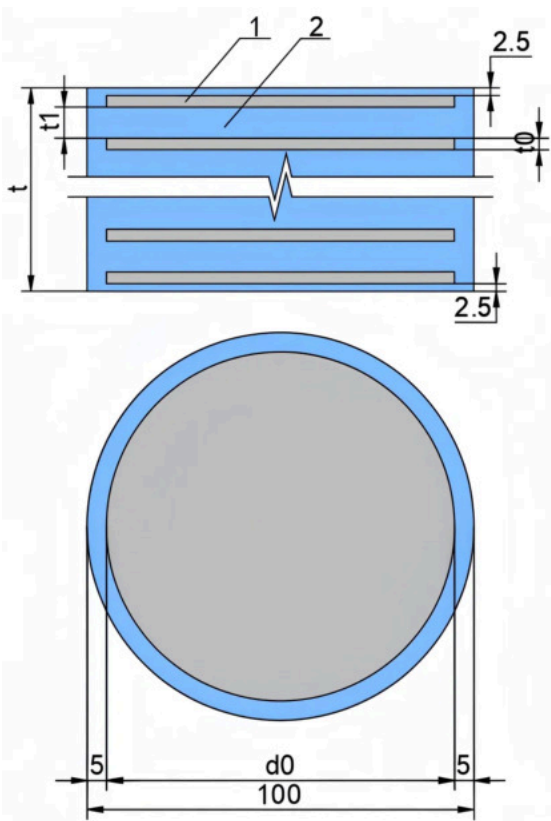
Structure of a Circular Laminated Elastomeric Bearing (Unit: mm) | 1 - Steel Reinforcement Layer; 2 - Elastomer Layer
